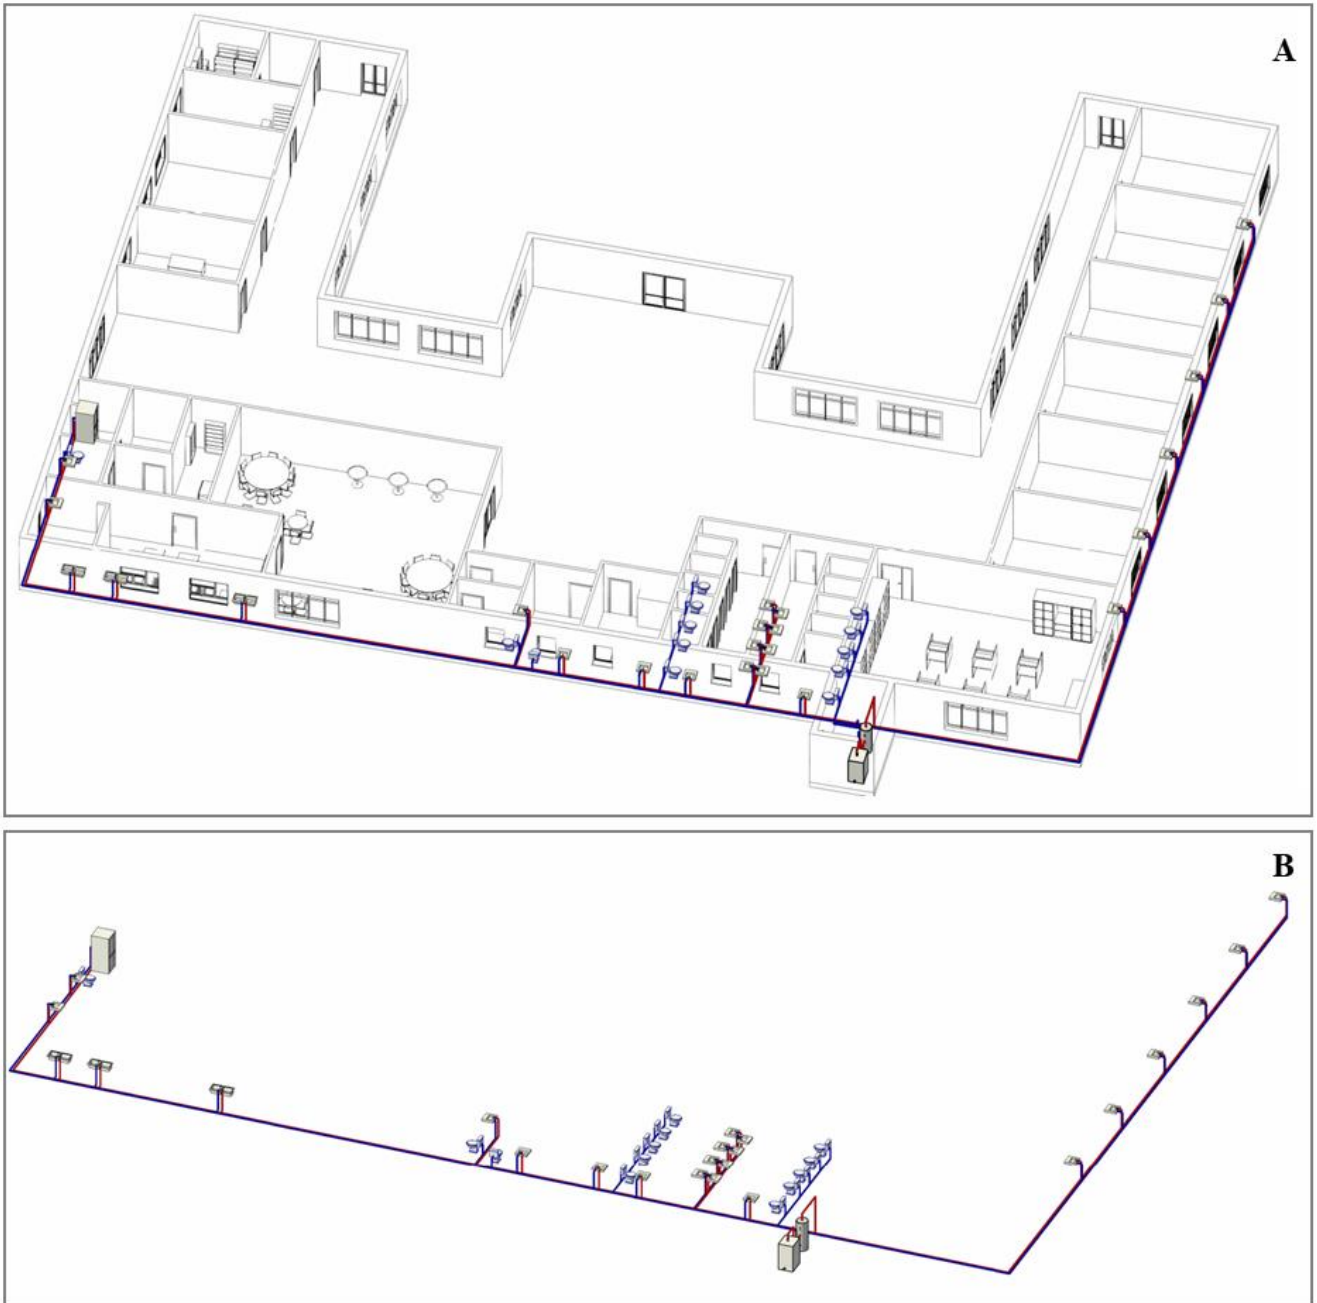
Building 1: A) building plumbing linked to the architectural model and B) building plumbing.
